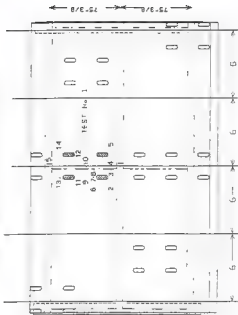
LVDT Locations (Second Bridge - Test No 1)
